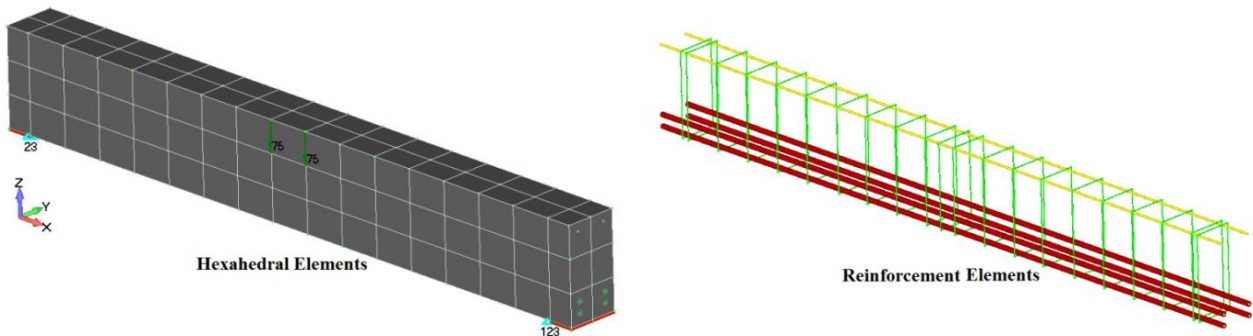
RC BEAM WITH STIRRUPS UNDER CENTRAL LOADING. FE MODEL.
